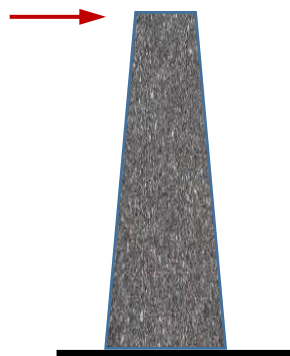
Typical Shape of Trapezoidal Cantilever Beam
